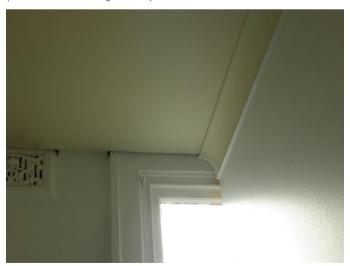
Detail of a first floor space showing a new stud wall located adjacent to an existing window. Note the new plasterboard ceiling cut around the window architrave and wall vent. (NBRSArchitecture, August 2016)
